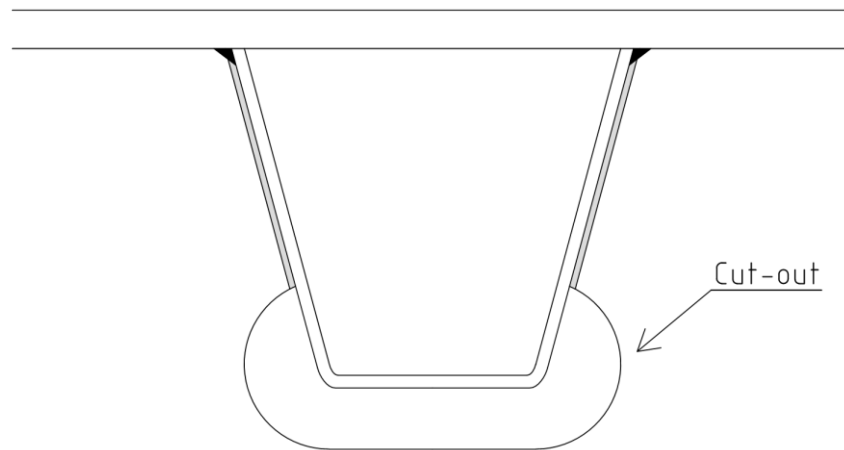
Weld at connection between rib and floor beam
